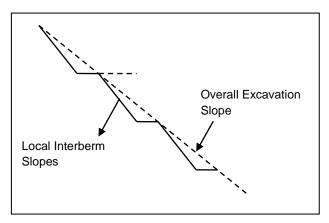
Illustration of interberm slopes and average overall excavation rock slope
